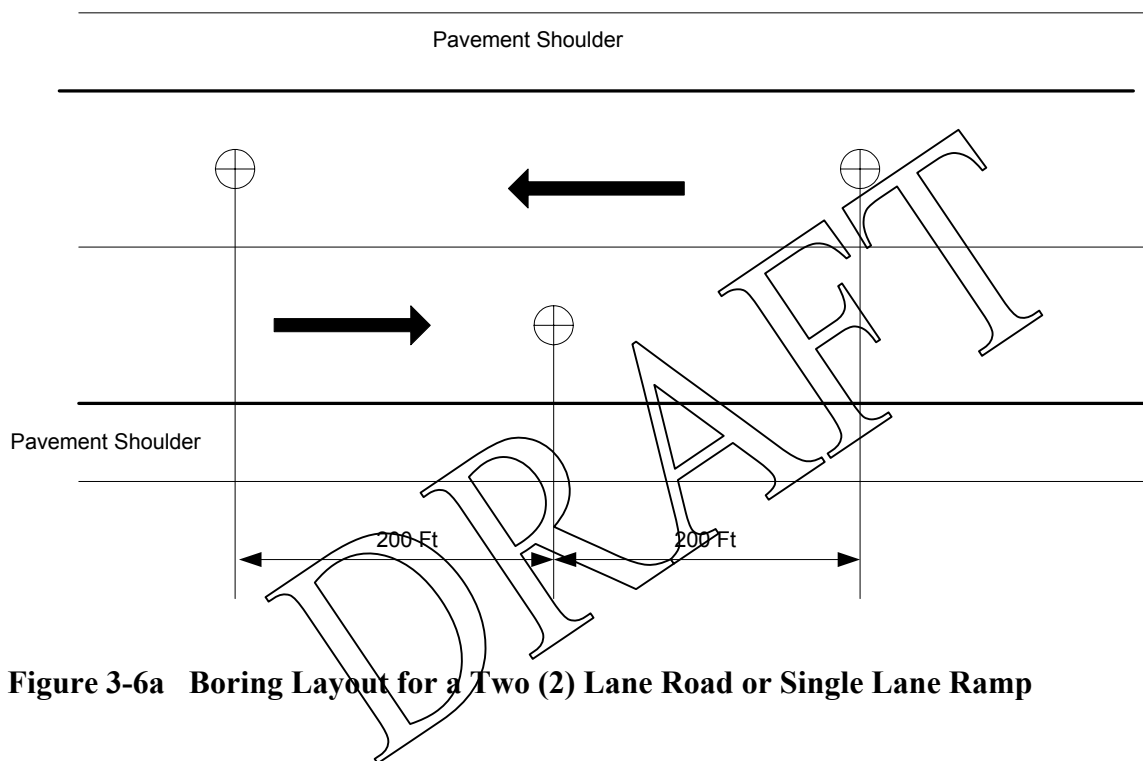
Boring Layout for a Two (2) Lane Road or Single Lane Ramp
